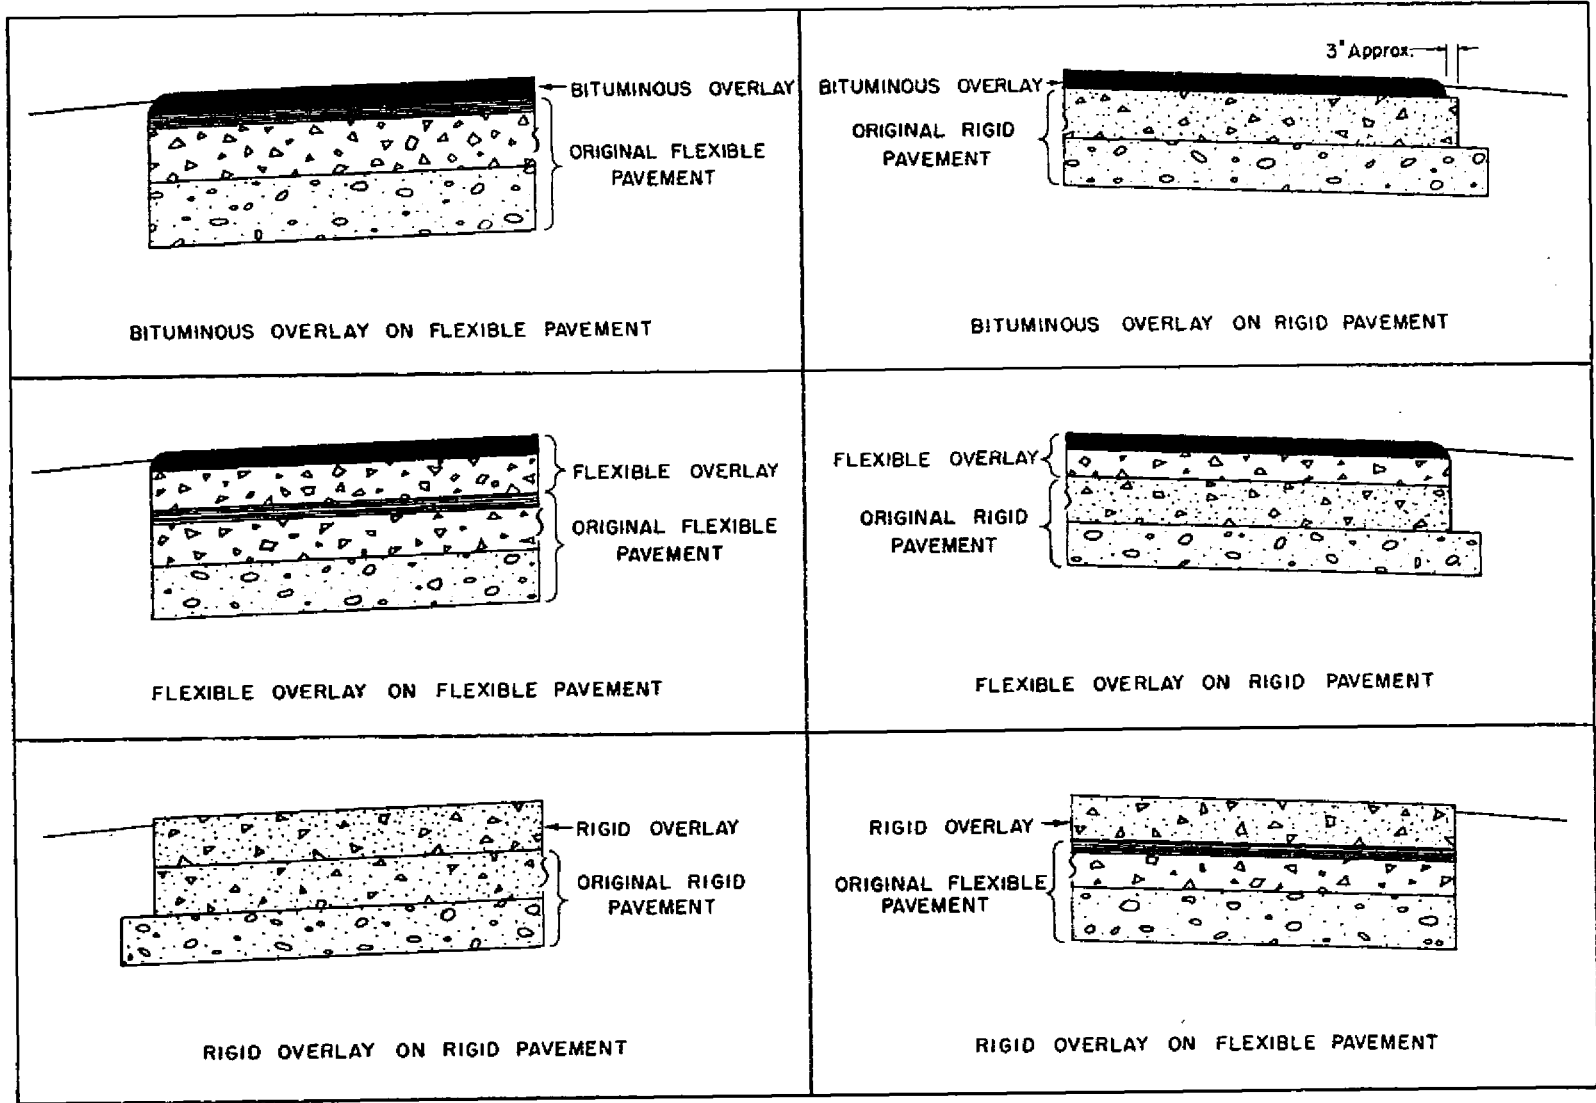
TYPICAL SECTIONS OF OVERLAY PAVEMENTS
